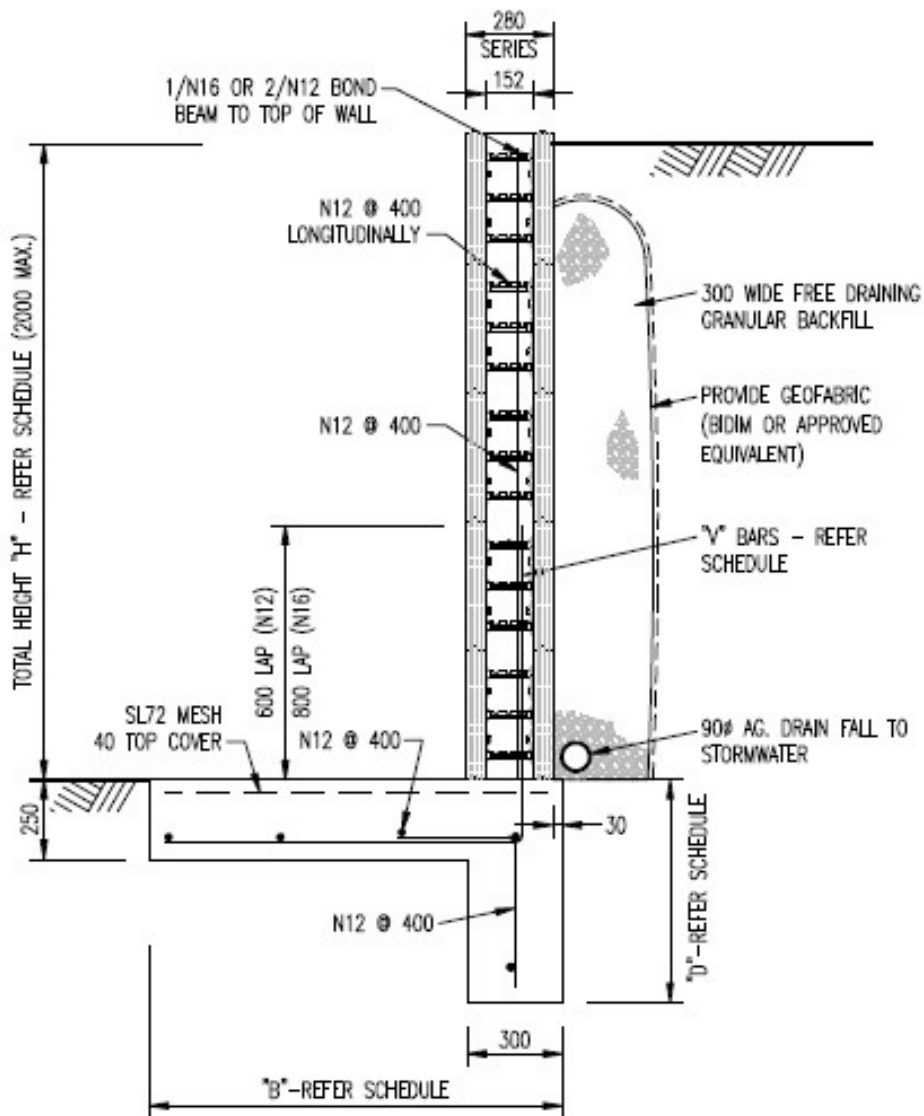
1200 – 2000 High Retaining Wall (230 Series Panels) High Side Footing
